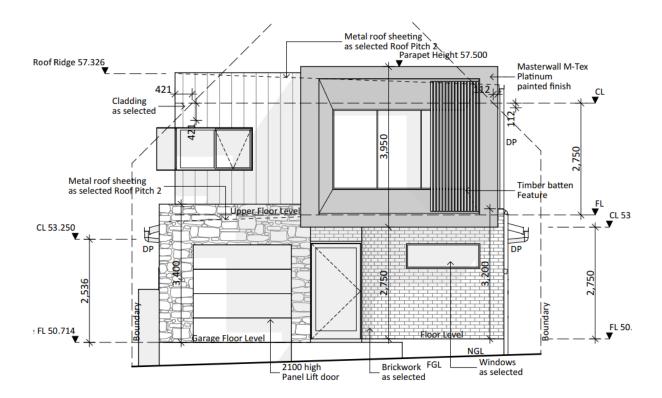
BUILDING ENVELOPE - FRONT ELEVATION
